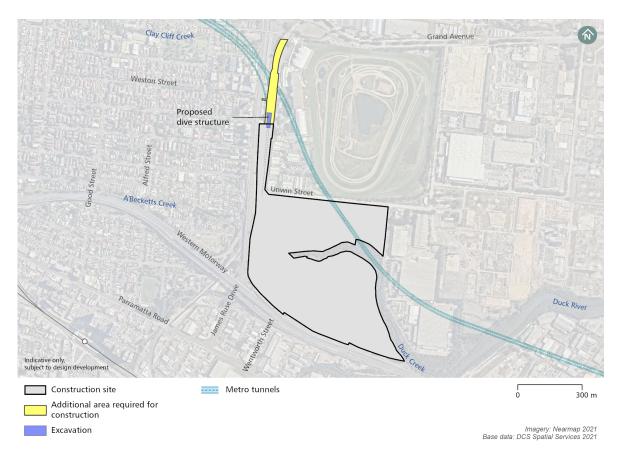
Clyde stabling and maintenance facility indicative construction site (proposed modification)
